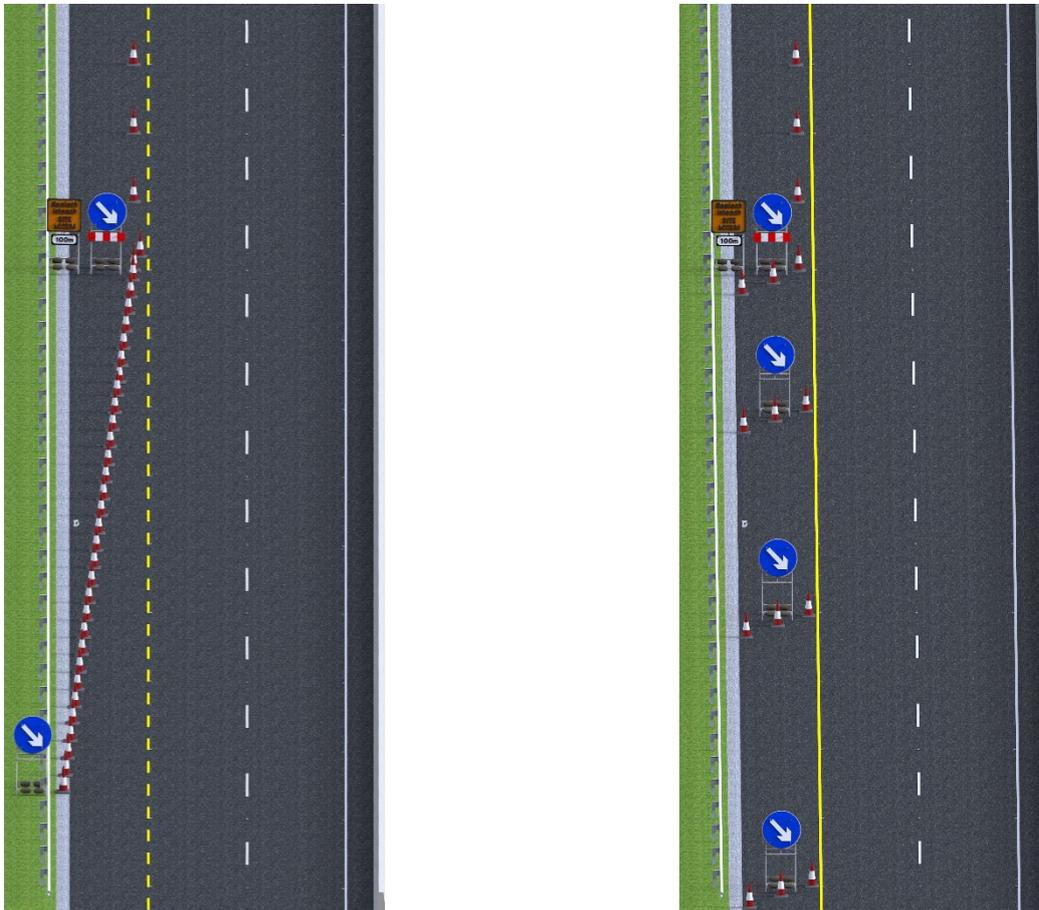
(a) Dual Carriageway Taper and
